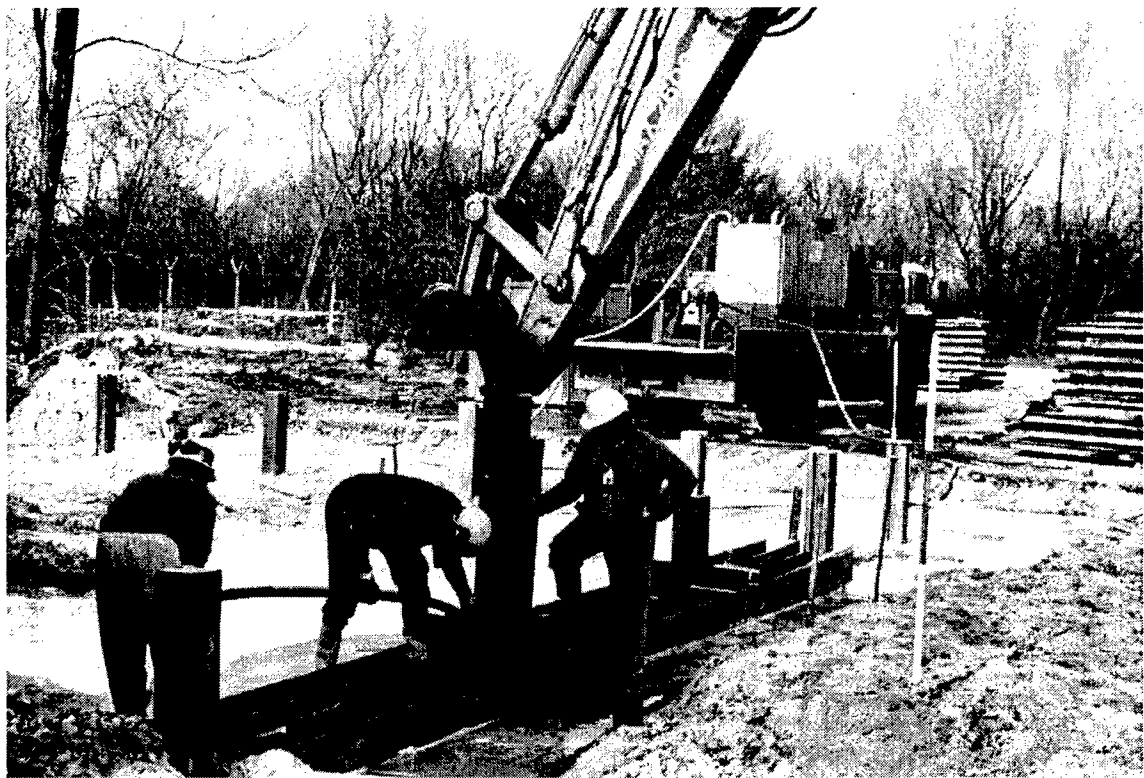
Start of the construction of the wooden box. First, some wooden piles are driven into the ground. The piles are used as a framework to strengthen the construction of the walls.
